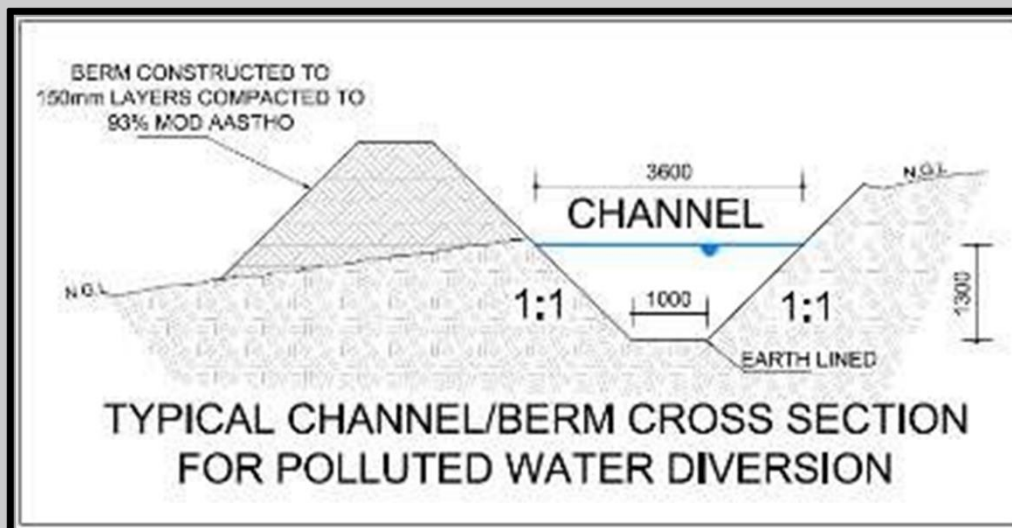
Typical Channel Cross Section for Surface Water Diversion
